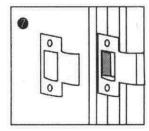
With the latch/deadbolt fitted and the door in the open position close the door gently against the frame and mark on the doorframe the top and bottom edge of the latch/deadbolt. For fire door application use intumescent packs (1 pack per latch / lock, 1 mm for 30 mins. & 2 mm for 60 mins.).
